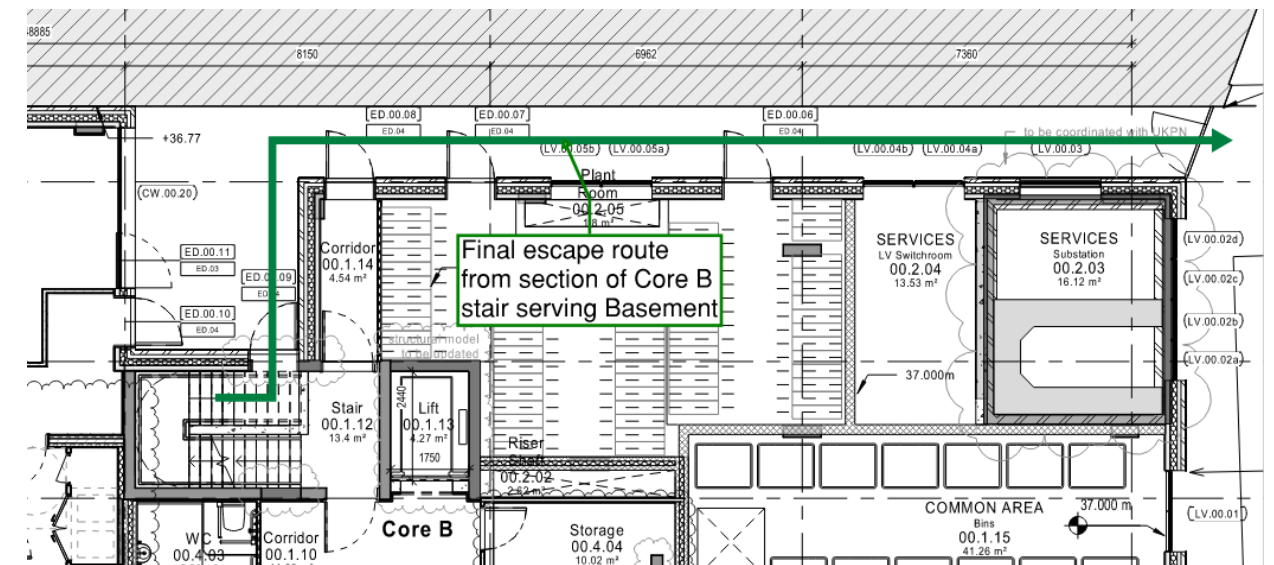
Final Exits from Sections of Core B Serving Basement Level
